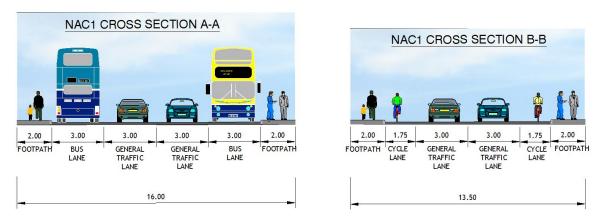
Route Option NAC1: Proposed Cross Section of Nutgrove Avenue -Churchtown
